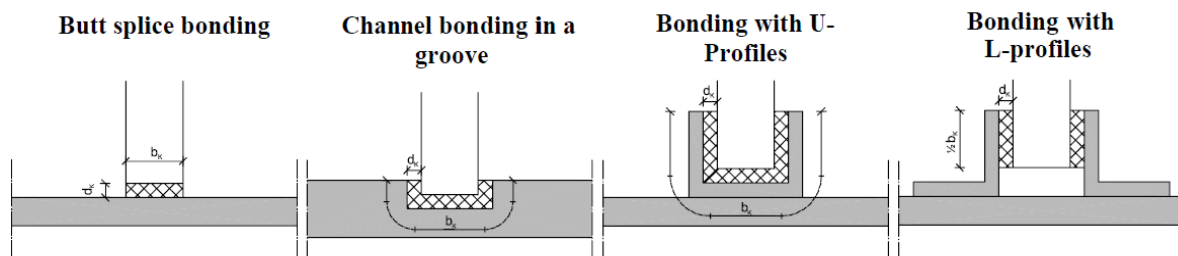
Jointing details of hybrid steel-glass beams [2.47]
